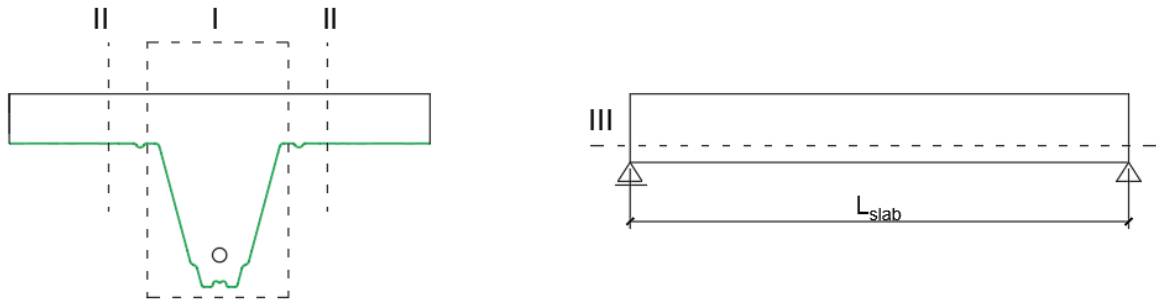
Failure modes: I – rib failure due to bending or vertical shear, II – interface failure due to vertical shear, III – longitudinal shear failure
